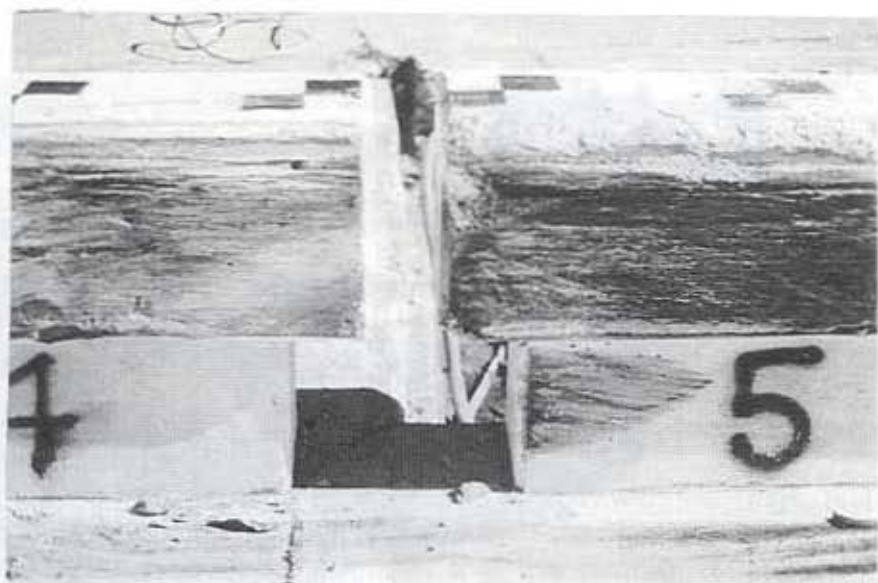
Bridge Rail Damage, Test NEOCK-6
